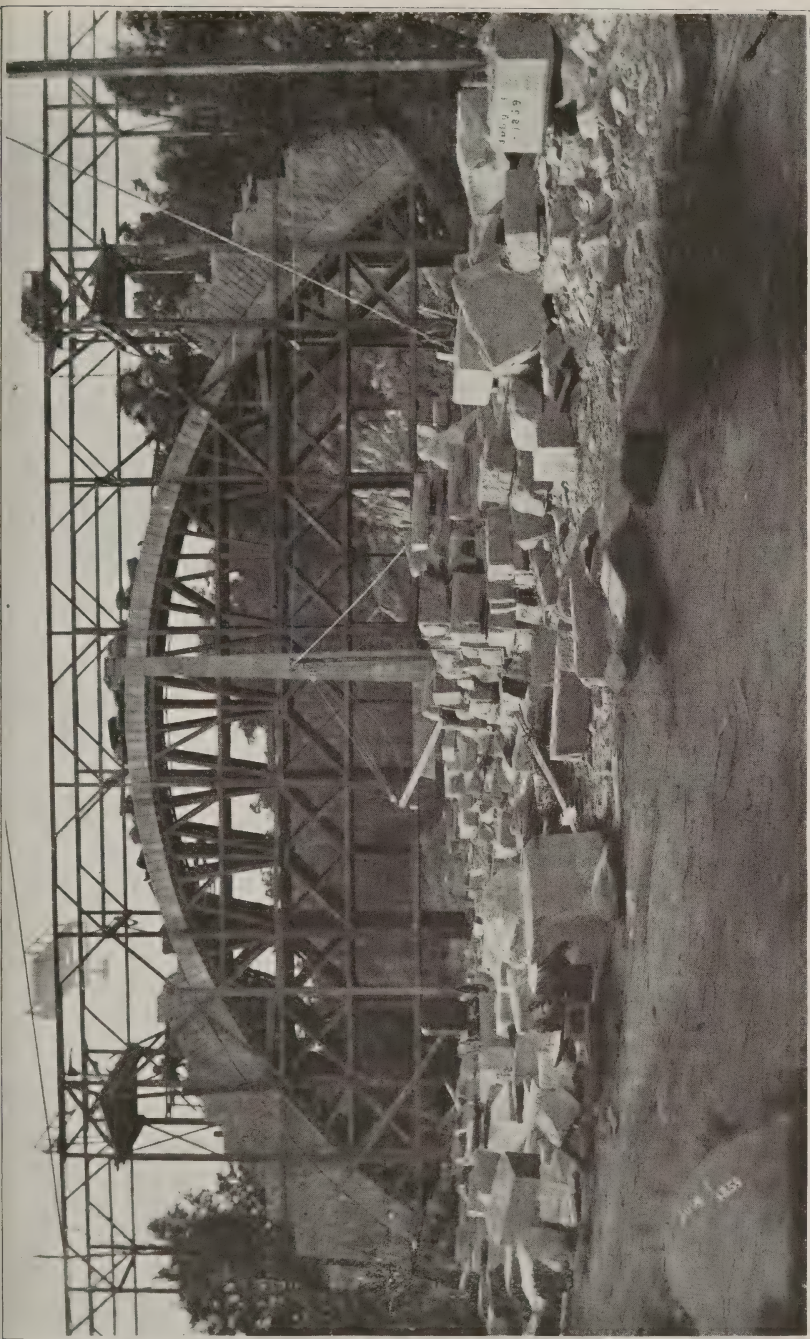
View of Cabin John Bridge during erection in 1858 showing centering for arch, scaffolding, and derricks.
